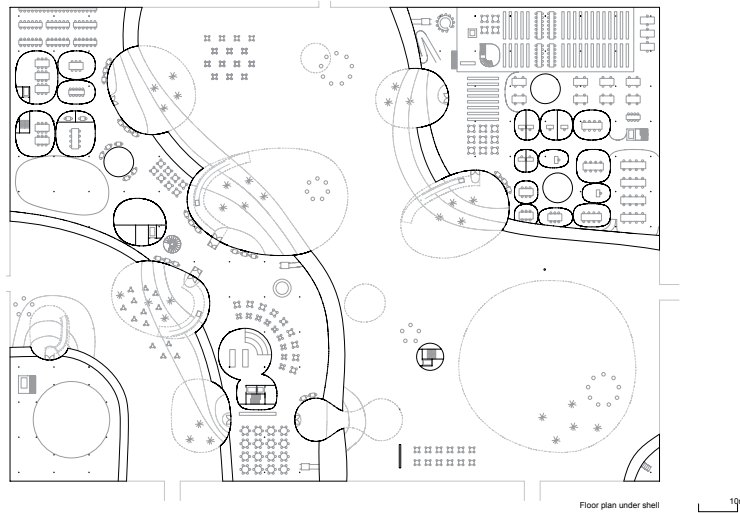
Learning Centre Floorplan under shell 1:1'000 (SANAA 2010)
